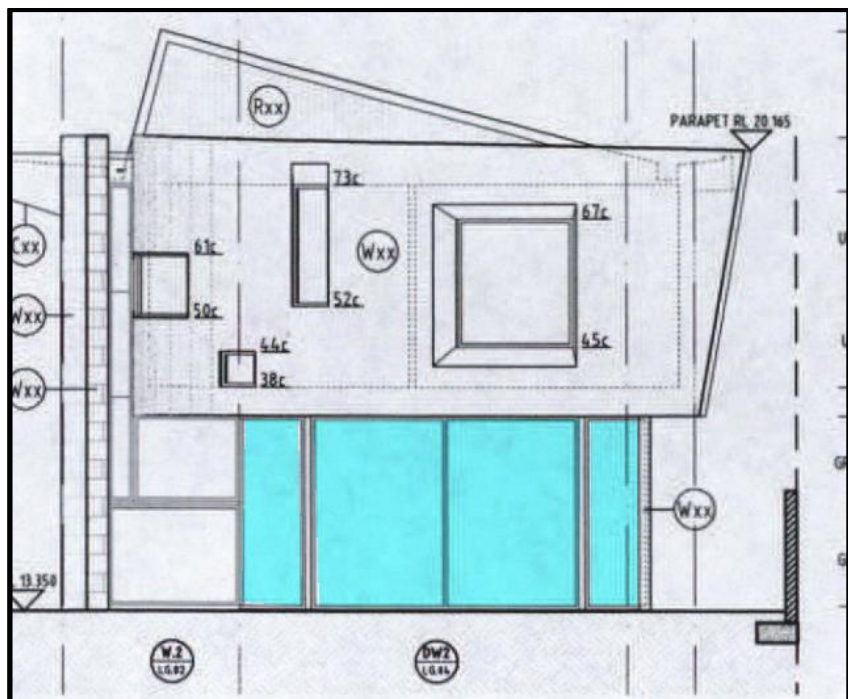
East Elevation of the Family Room at No. 27 Waverley Street (major opening highlighted blue)
